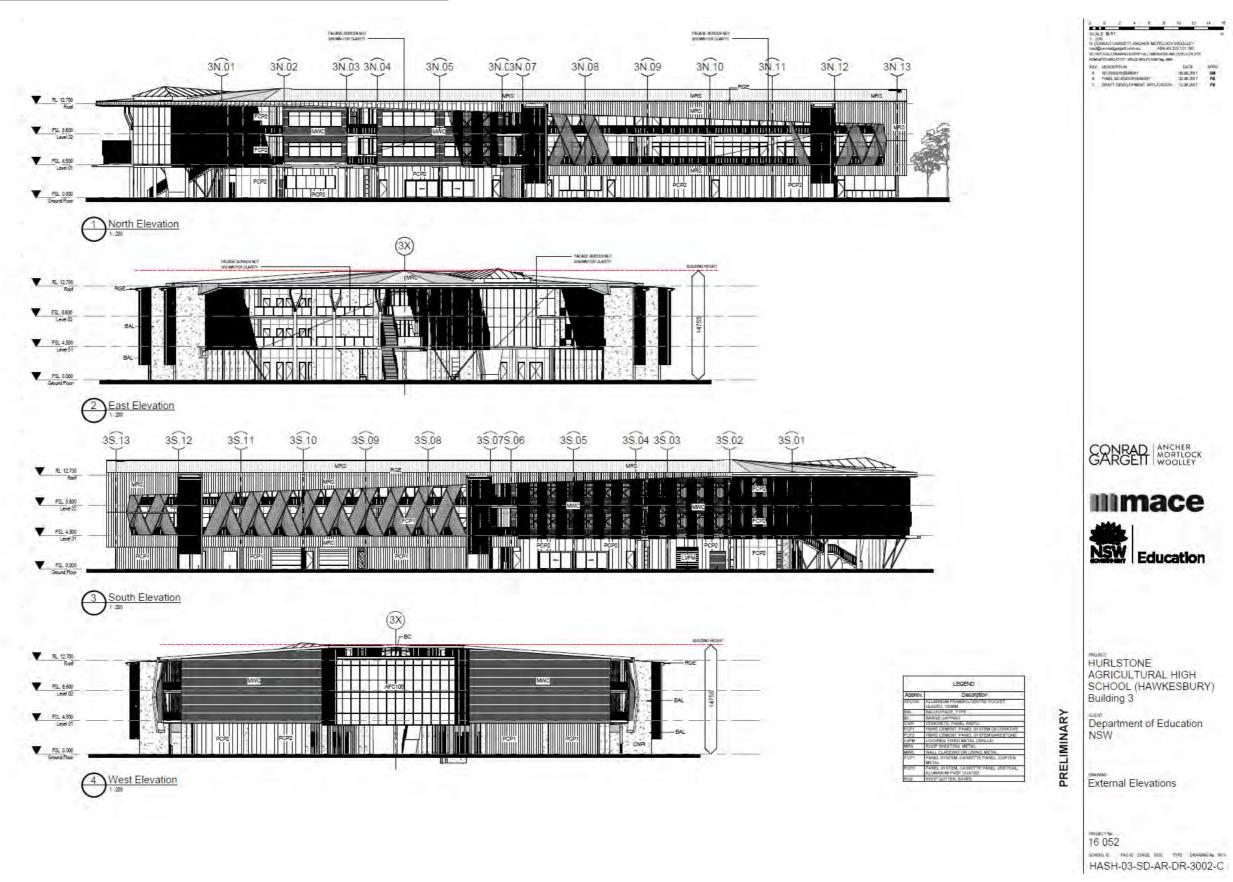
Proposed Sections Building 3 Conrad Gargett Ancher Mortlock Woolley (2017) HASH03-SD-AR-DR-3002-C
